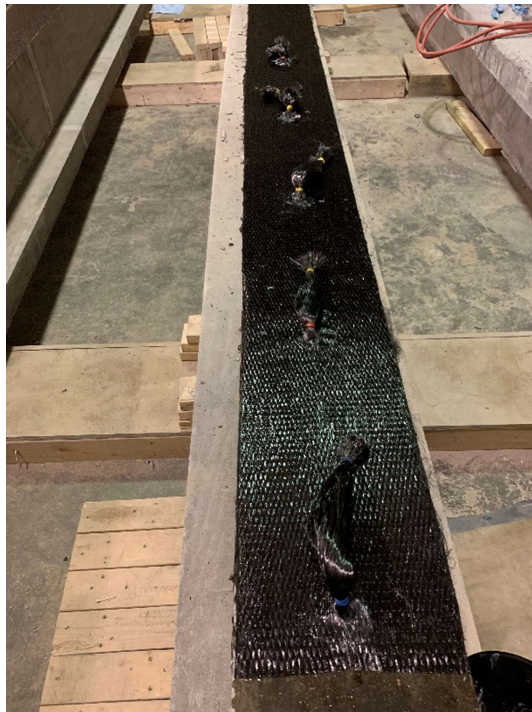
Carbon FRP Splay Anchors Installed in Anchor Holes
